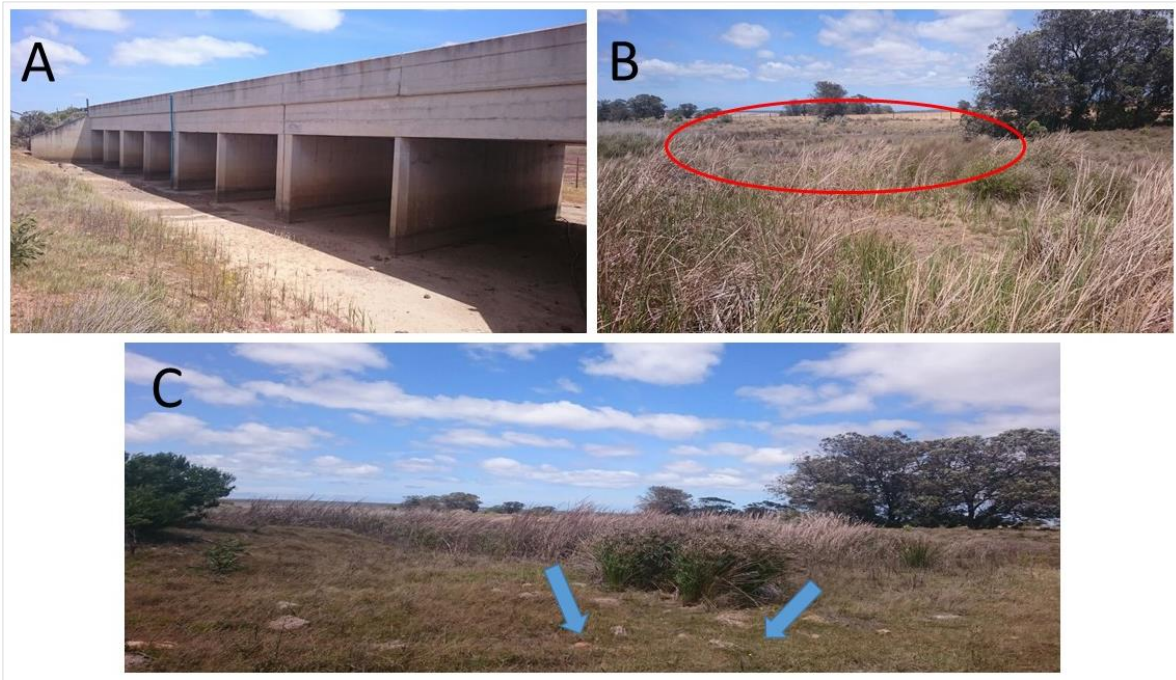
Stilling well installed at the Blomkraals site and the culverts used for the initial flow measurements (A), pond upstream of the Blomkraals flow monitoring station which requires flooding before flow occurs through the bridge (B), cross-section of the area where flow measurements were done for the remainder of the study (C).
